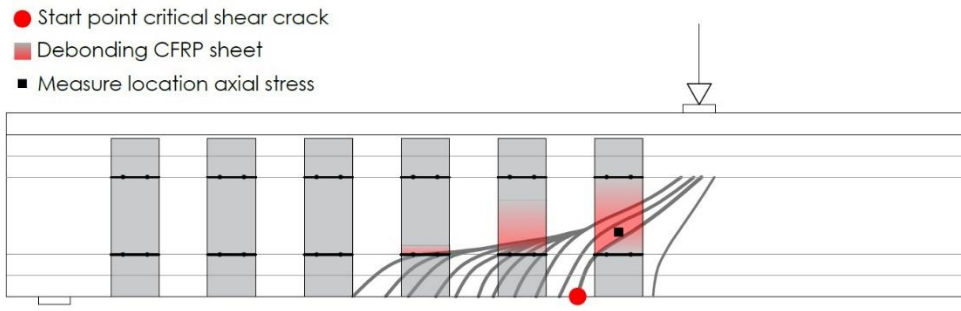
Crack pattern and CFRP debonding specimen I-VA-SP4 at load step 72
